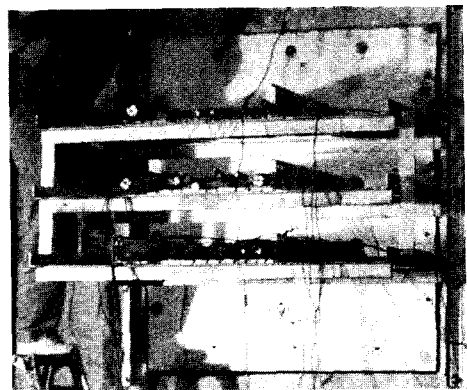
Penetration Seal for Fire Test (Specimen 1).
